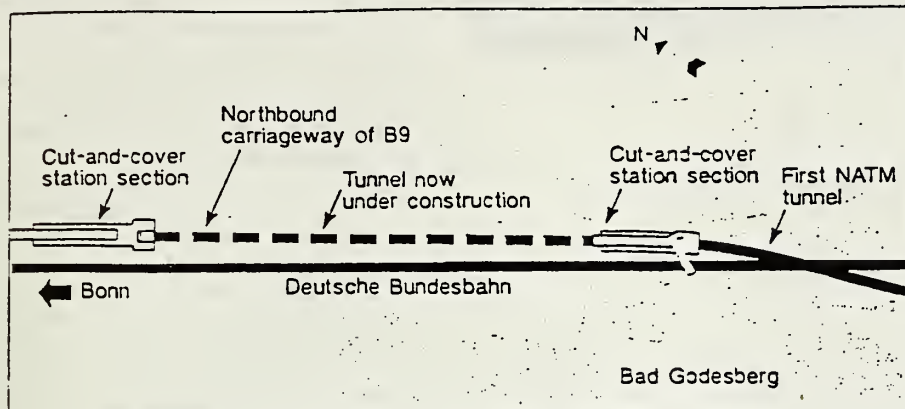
Alignment of the new tunnels, beneath the existing metro line.
